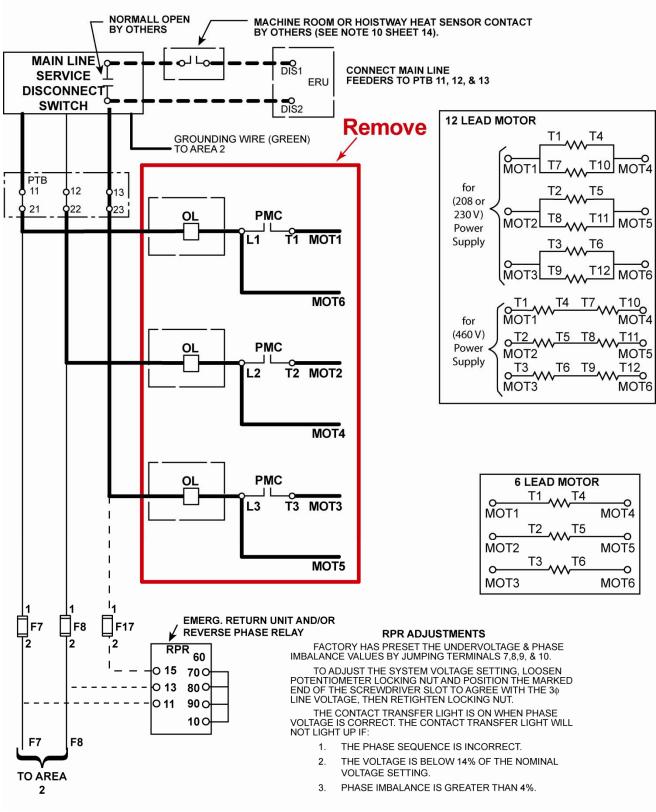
Removal of Inside-Delta Starter Overload and Motor Contactor
